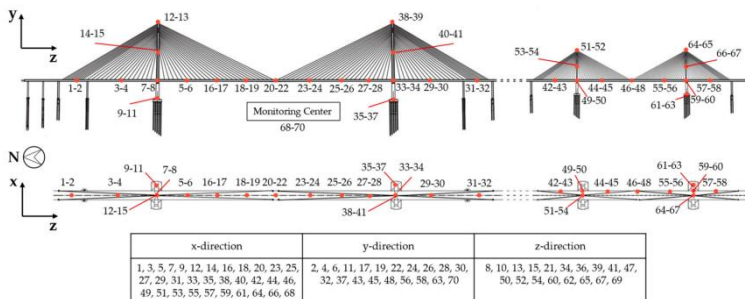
Sensor locations of the cable-stayed large-span bridge (consists of a northern-branch bridge and a southern-branch bridge)
